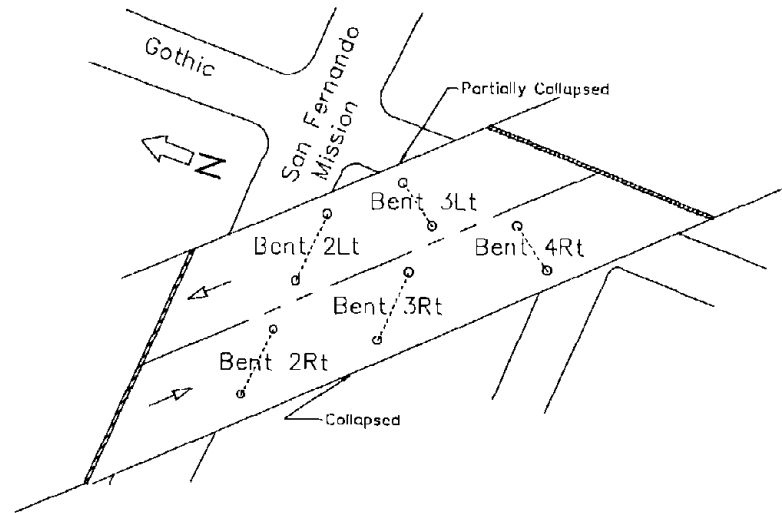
Schematic Plan of Mission-Gothic Undercrossing Bridge
